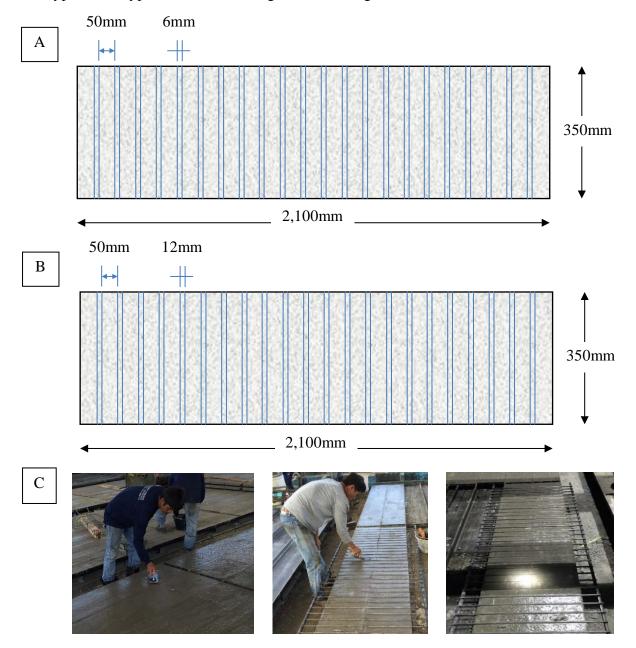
(A) Dimensions of concrete slabs with 3mm latitudinally indented surface, (B) with 6mm latitudinally indented surface (figures are not drawn to scale). (C) Concrete slabs in preparation (left: Type 1, centre: Type 2, right: Type 3)
